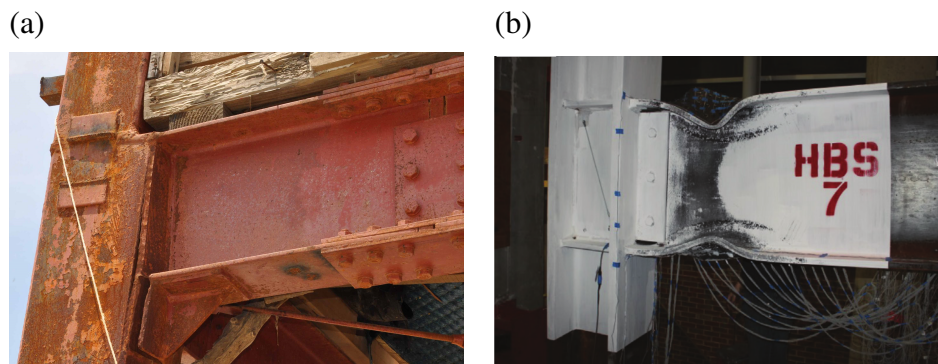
(a) Weld failure under combined tension and shear after the 2011 Tohoku Japan Earthquake (reprinted with permission from the *Earthquake Engineering Research Institute* (EERI), Ltd) [1], (b) beam-to-column joint connection failure under combined bending and shear testing [2] (reprinted with permission from *Elsevier*, Ltd).
